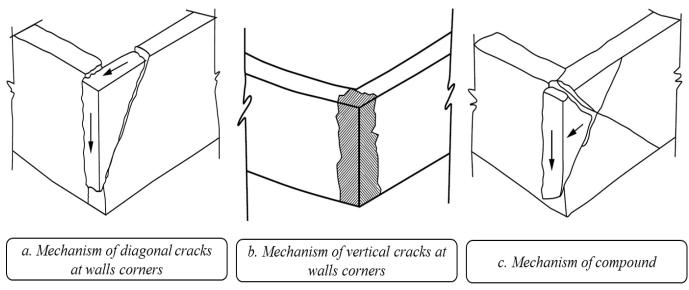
Mechanism of Cracks at Corners (Mardani et al., 2019).
